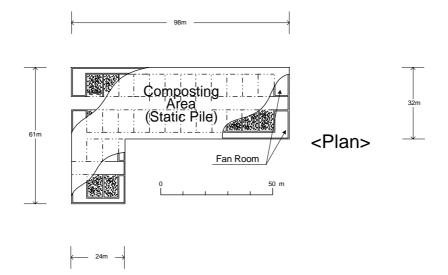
Layout of the Composting Area (Static Piles) in Cimsa
